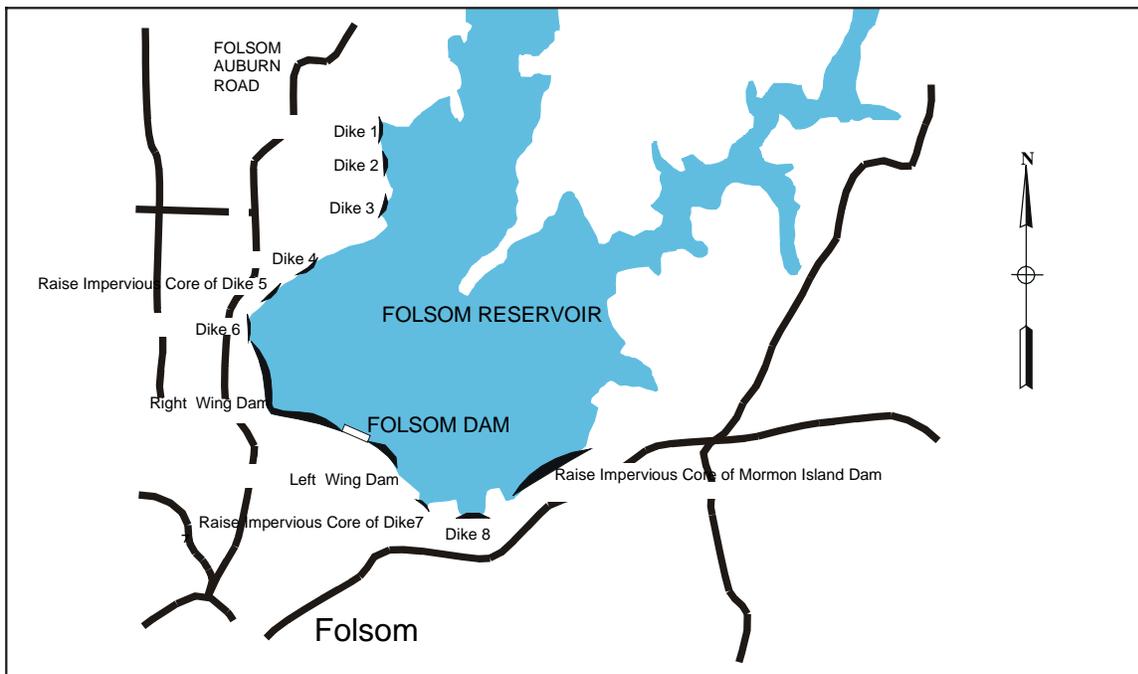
PLAN VIEW OF FOLSOM DAM AND RESERVOIR SHOWING LOCATION OF DIKE RAISING IN THE SURCHARGE COMPONENT.
